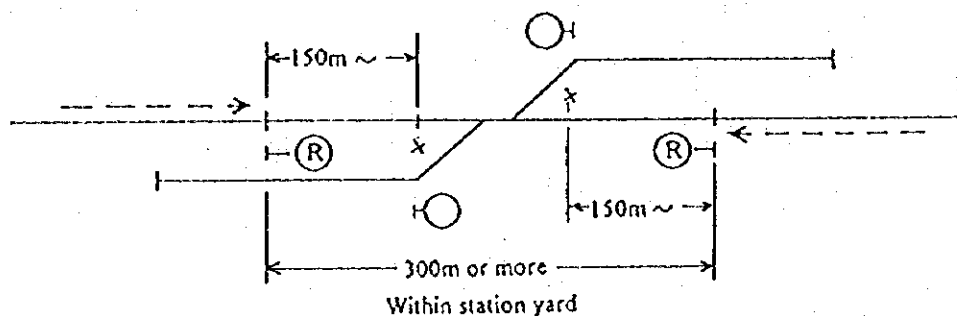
Interchange Station to be Constructed on Hai Van Pass
